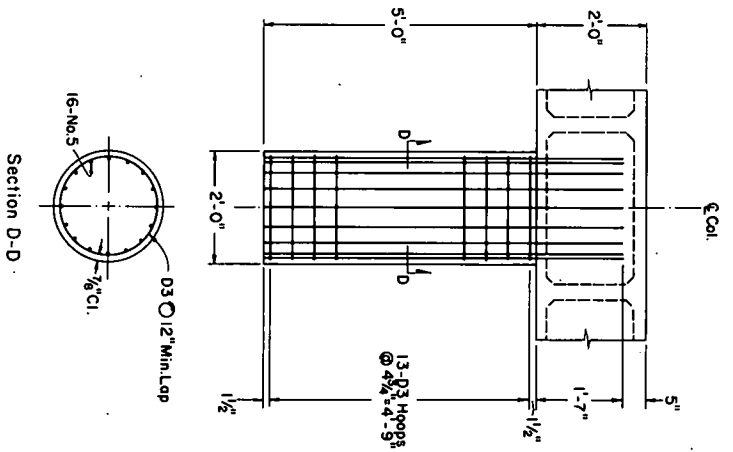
Column Reinforcement for Specimens SC-3 and ST-6
